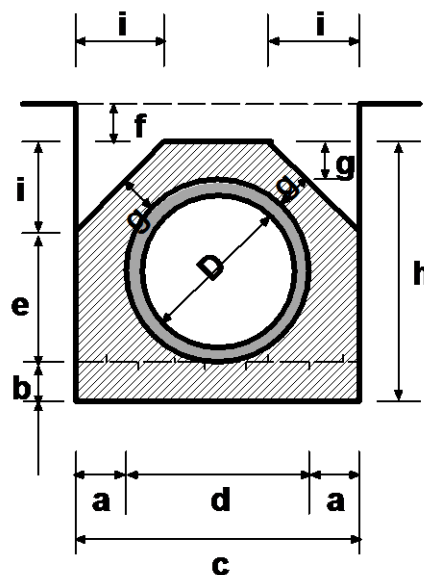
HEADWALL TYPE 4 (FOR ACCESS CULVERTS)
